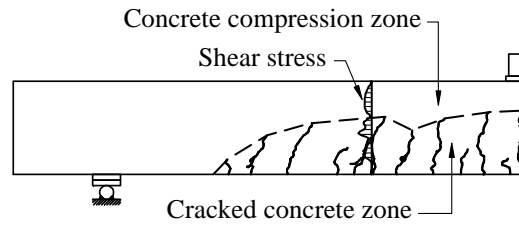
Concrete compression region and cracked concrete zone in a beam
